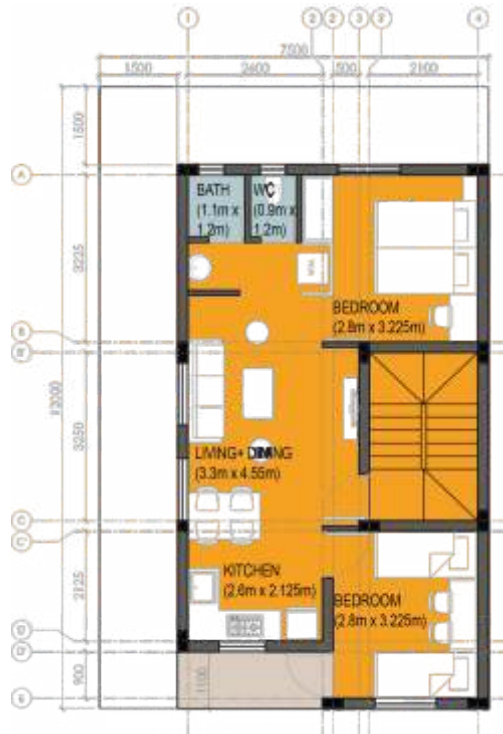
Typical ground floor plan of Type 3 dwelling unit
